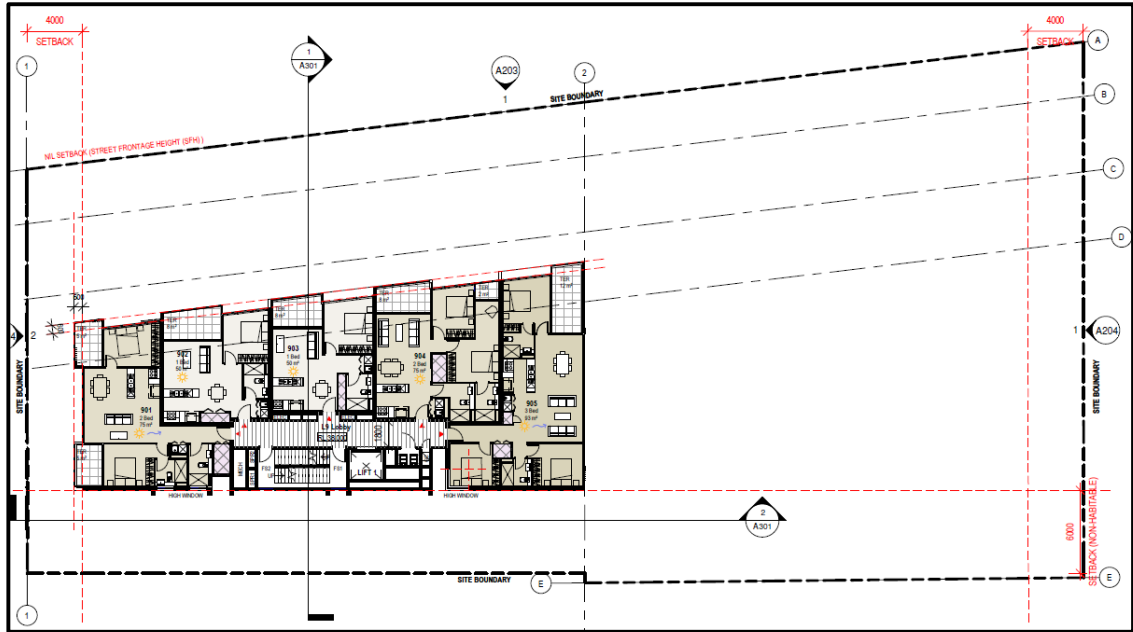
Proposed Level 9 Plan (*Source: Brewster Murray)
